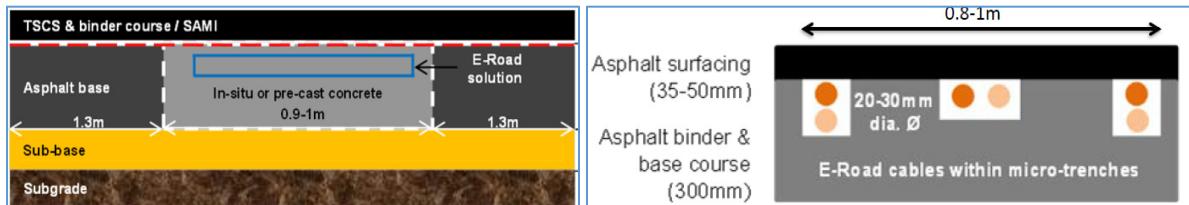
Roadway cross section of trench-based construction (left) and micro-trench-based construction (right).
